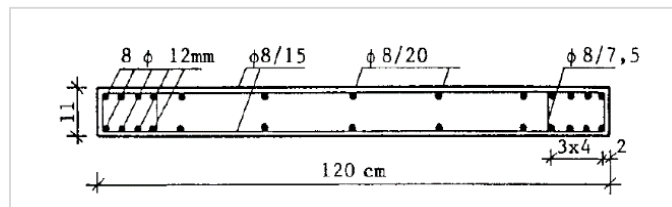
Cross section of the wall tested by Zhou (1988) [16] at Tsinghua university in Beijing
